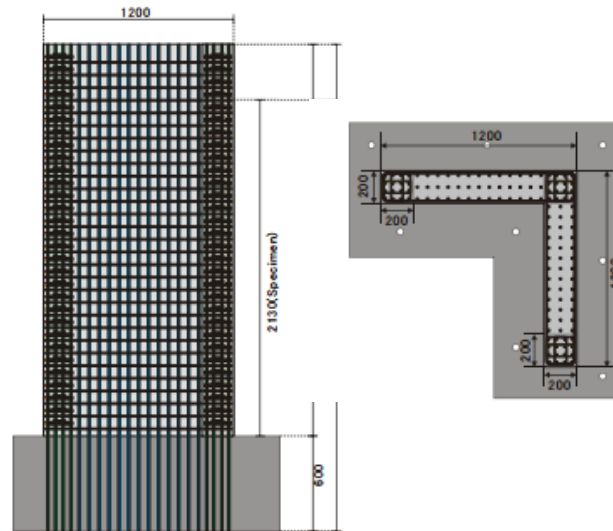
Test Specimen Reinforcement Details for Inada [102]
